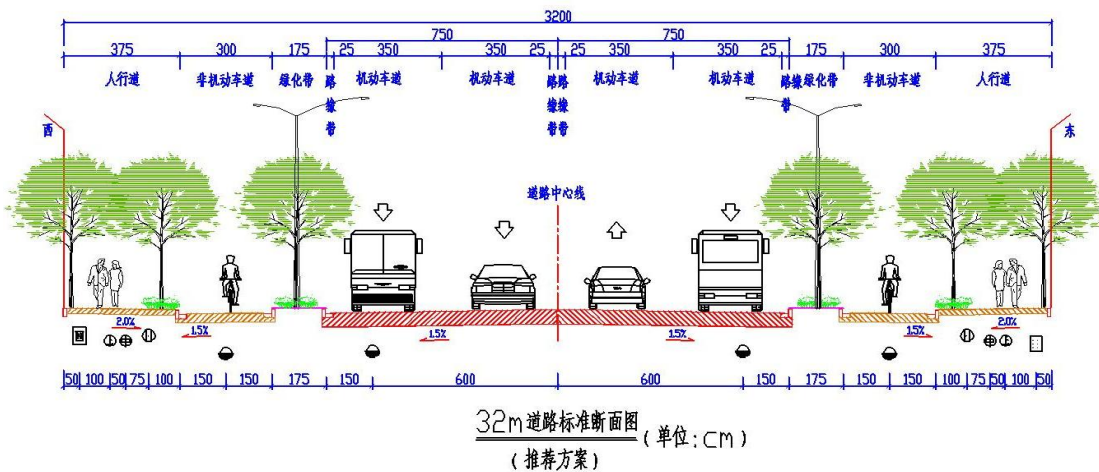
Cross-sections of No. 3 Road in Lufeng
